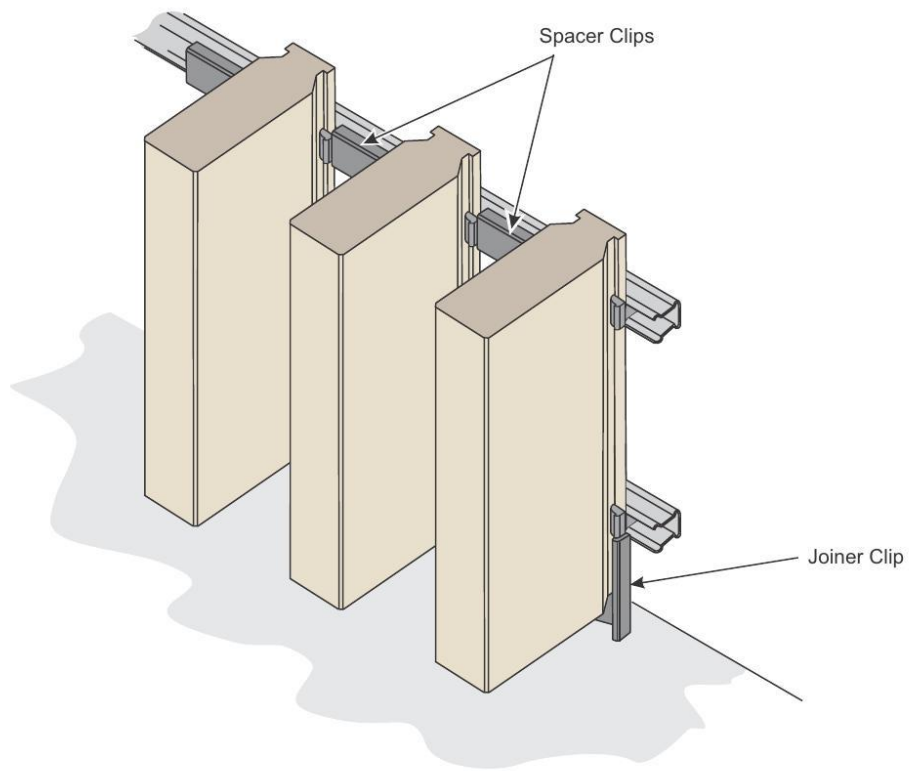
Spacer and floor offset joiner clip detail (vertical)
